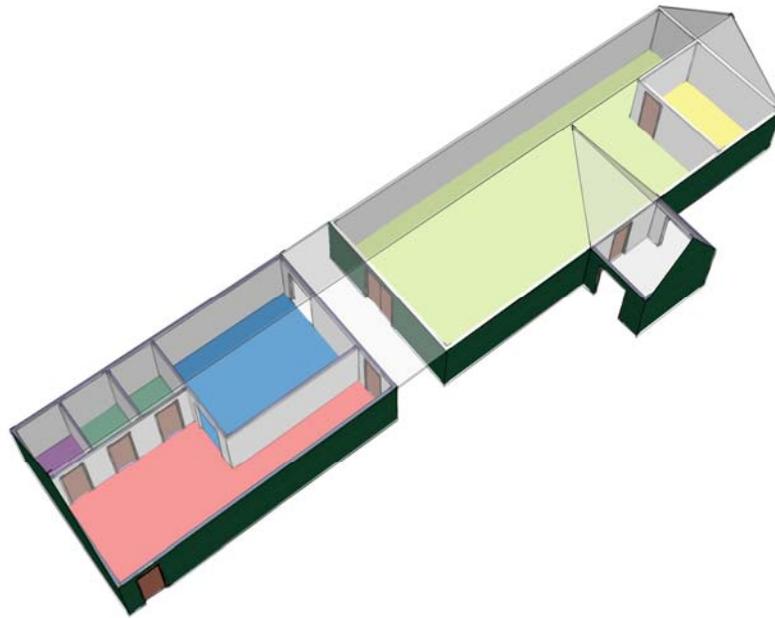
Existing Floor Plan Recreation & Crafts Area and Pool Changing Rooms
